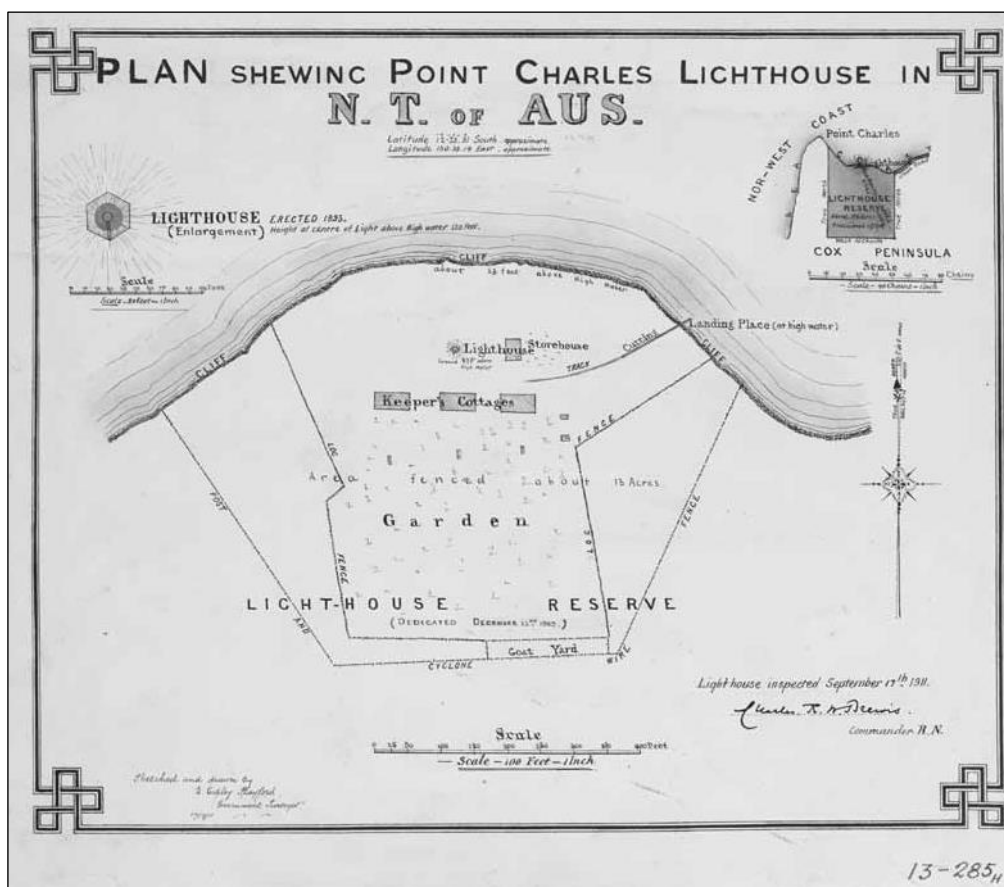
Plan showing the site for the proposed Point Charles lighthouse, 1911.
